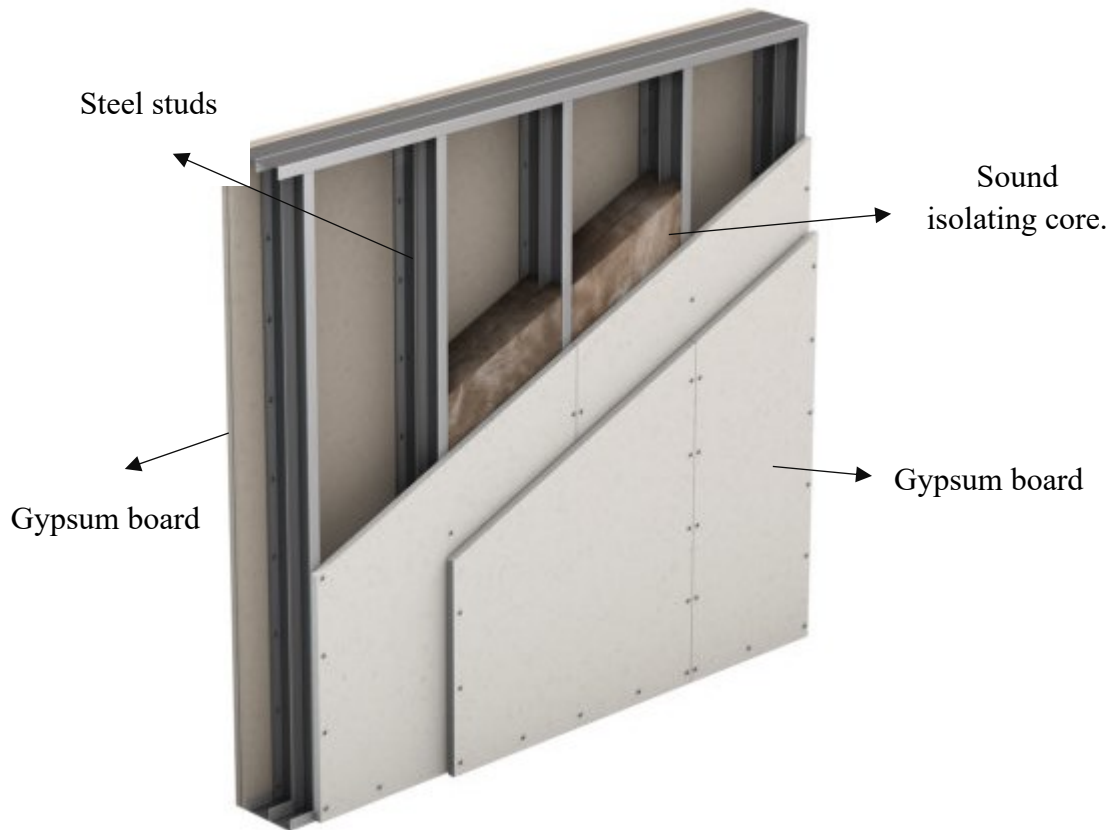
Gypsum drywall structure. Source: (<https://www.knaufestafrica.com/>)
